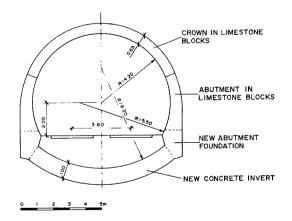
Reconstructed concrete invert in Anhydritic shale during 1980-1986, Tunnel km 6.2 (after Rothpletz, Lienhard & Cie, 1986)
